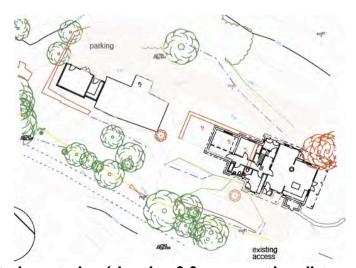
Site layout plan (showing 9.0m separation distance)
